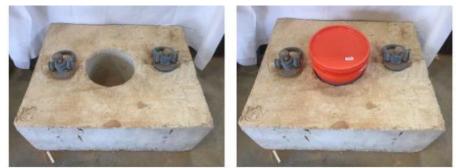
Reinforced concrete confinement block with and without a DCP Specimen (Nemiroff 2016)
